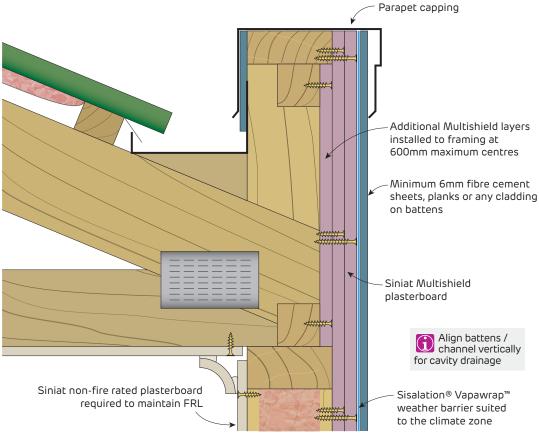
External Timber Wall to Non-combustible Roof Lining
